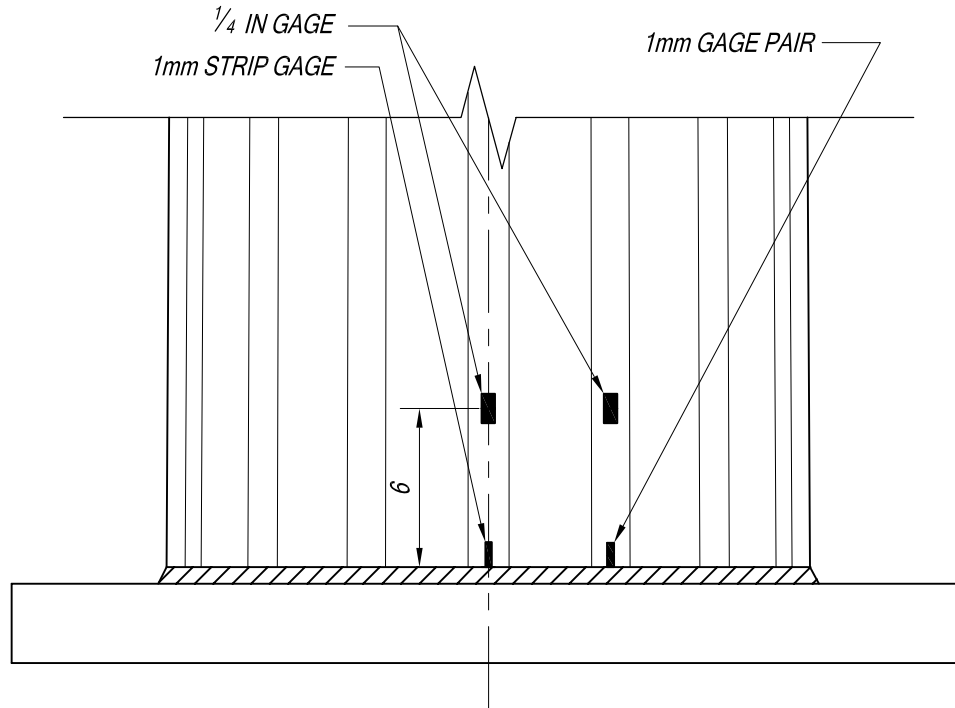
Type XI specimen elaborately instrumented specimen strain gaging plan, opposite side
